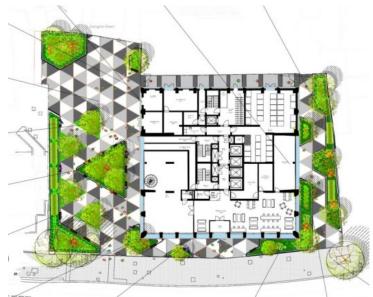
Visual of the green space as per planning application ref: 2023/01324/PA. The application site is to the left of this plan.
